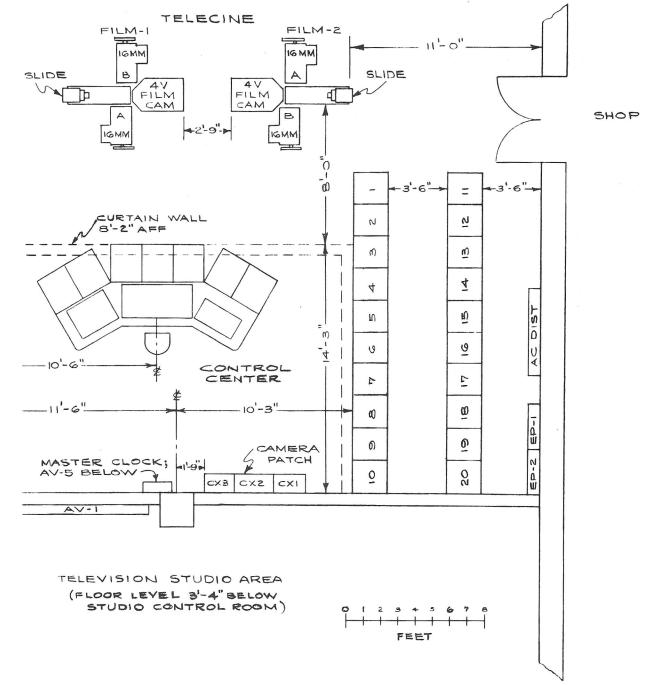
Typical floor plan of a portion of the technical area of a television plant.
